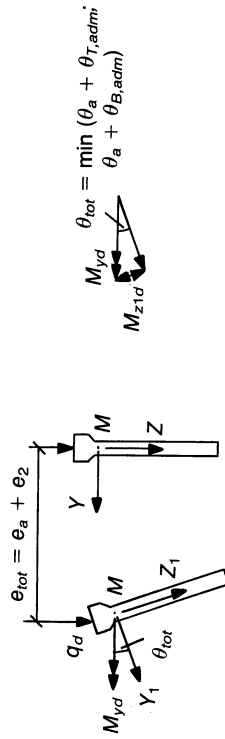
Deformed position of the cross-section in the middle of the beam
